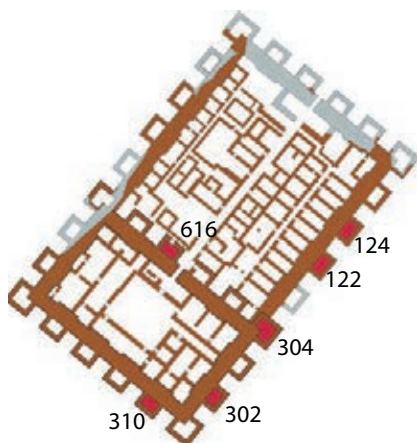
Tower 302 and matching internal buttress on the exterior wall (NW).
